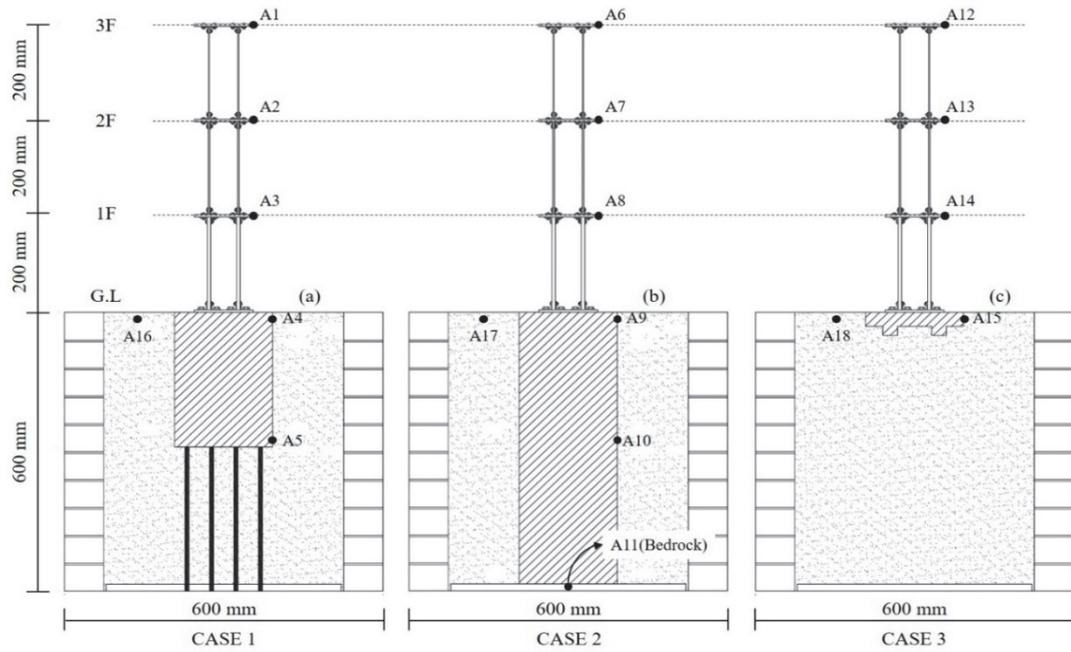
Test model: (a) CASE 1: half-embedded with pile foundation; (b) CASE 2: fixed deep basement; (c) CASE 3: shallow foundation
